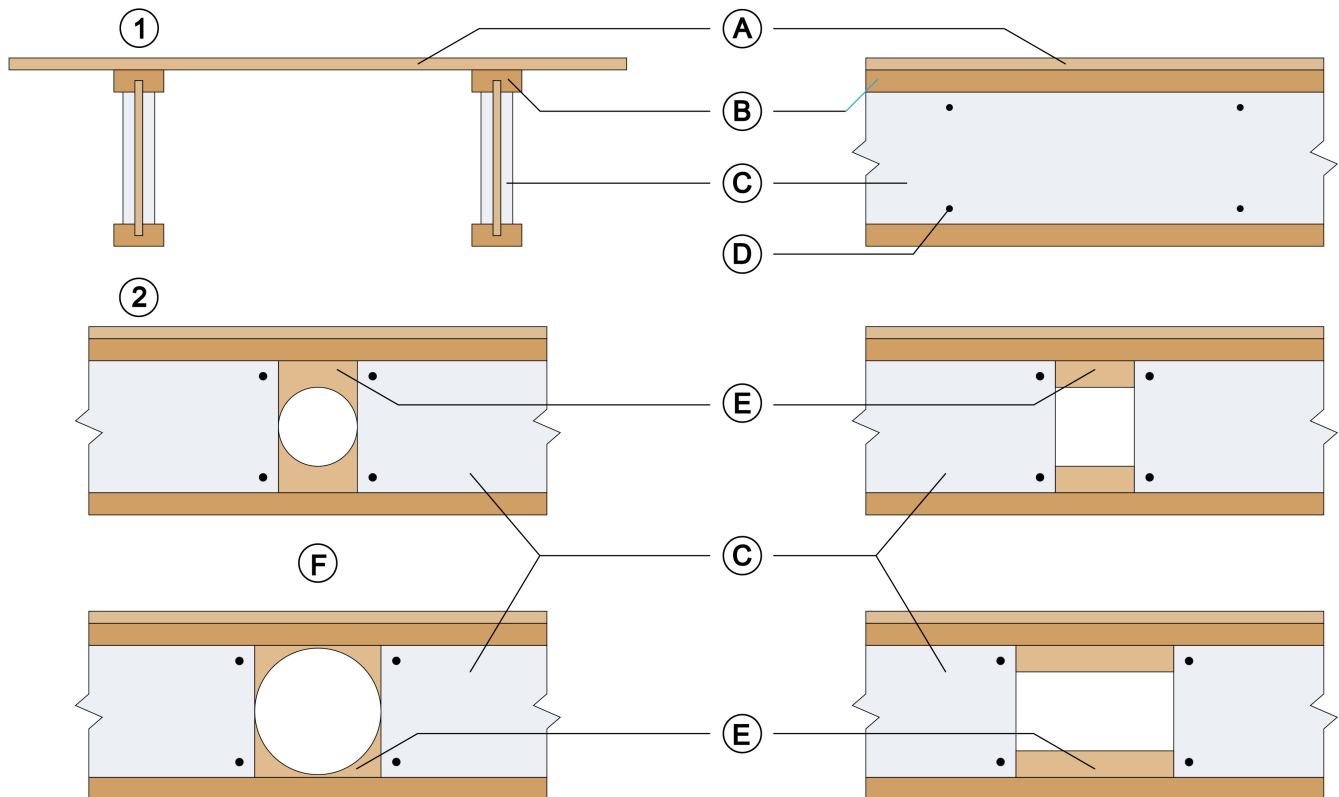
Fire protection of floors FP-02 - fire protection: 12.5 mm (1/2 in.) gypsum board attached directly to web
